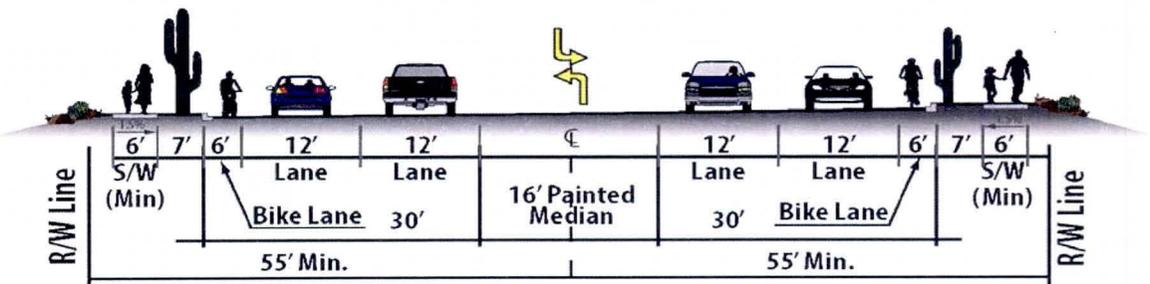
Ultimate Roadway Cross Section – Lost Dutchman Boulevard to Southern Avenue
